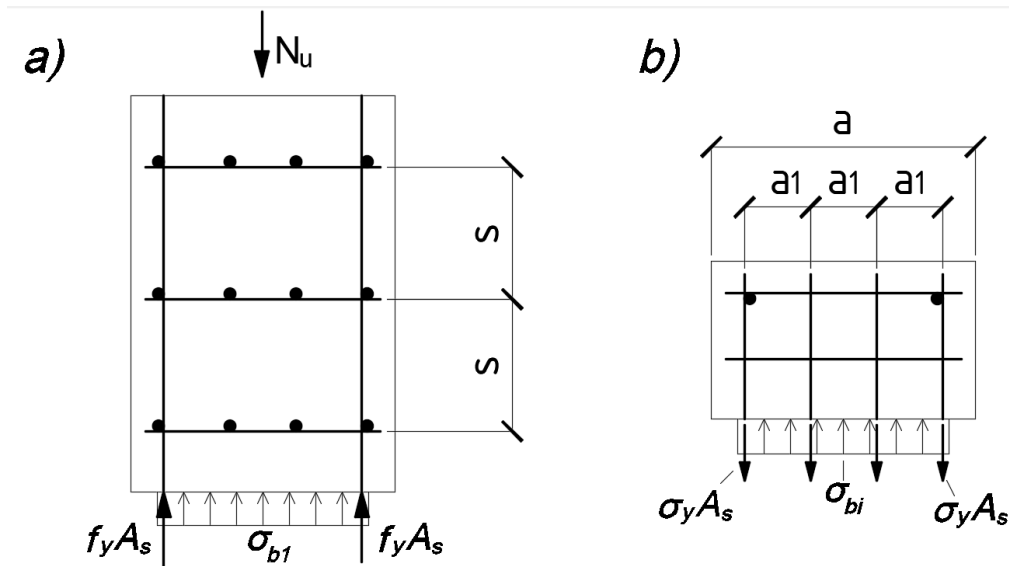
Calculation model of a reinforced concrete element with transverse mesh reinforcement at the stage of ultimate equilibrium: a - external and internal forces in a flat horizontal section; b - external and internal forces in a flat vertical section
